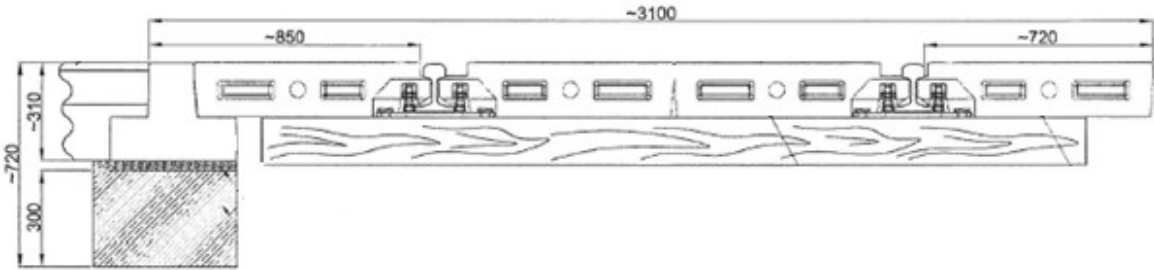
Cross-section of ELASTrack level crossing surface (Technical Approval 2015)
